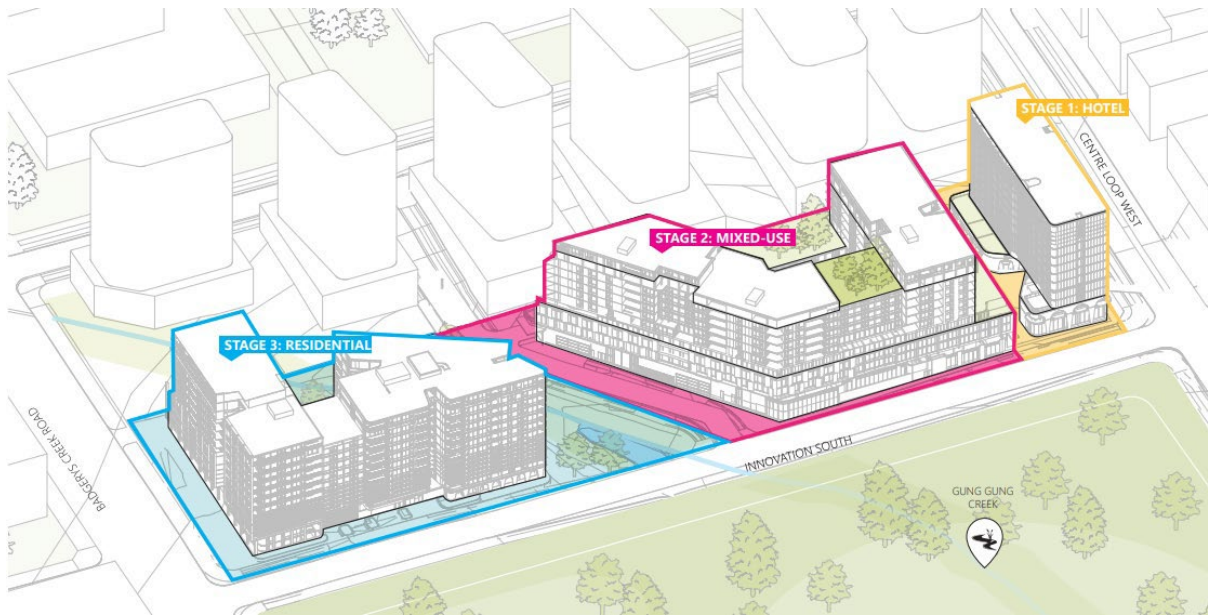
Proposed stage plan of the development (source: PLUS Architectural Design Report (2025)).
